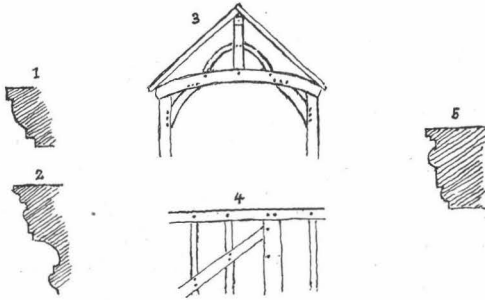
1. Section, dais-beam, Hammingdean; 2. dais-beam, Goddards; 3. Highbrook House, section of roof; 4. Highbrook House, part of west wall; 5. upper story beam, Langridge.
